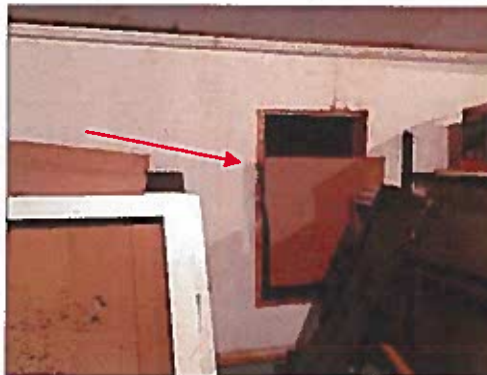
View of access panel on north wall of upstairs equipment room leading into attic area above the Kitchen.
